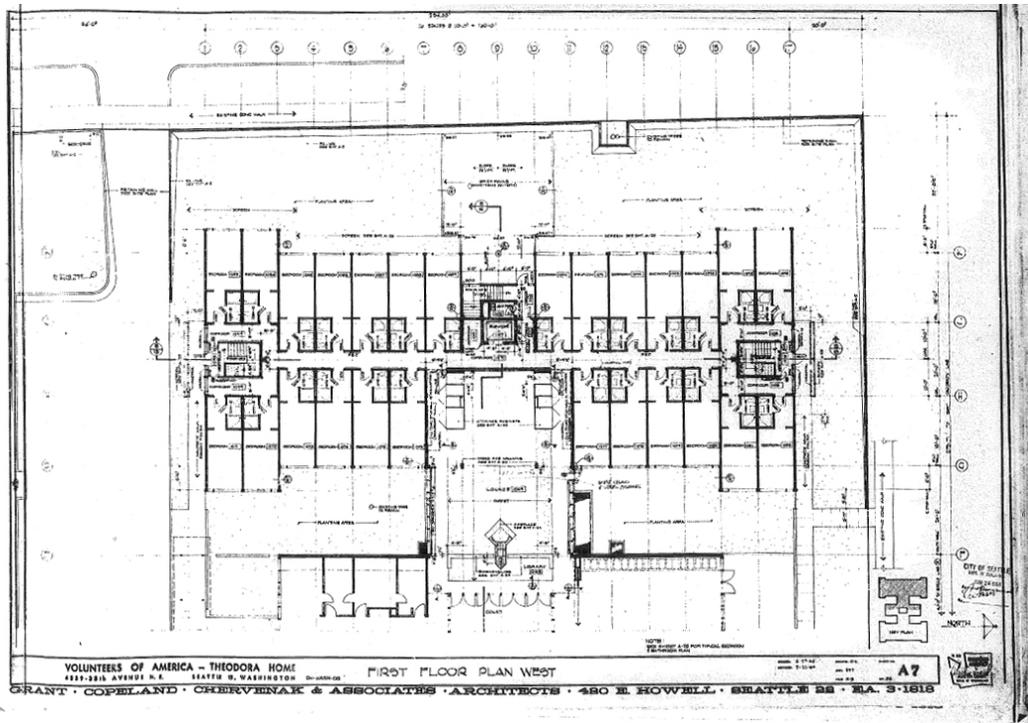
Original First Floor Plan West (Seattle Department of Planning and Development archives)
